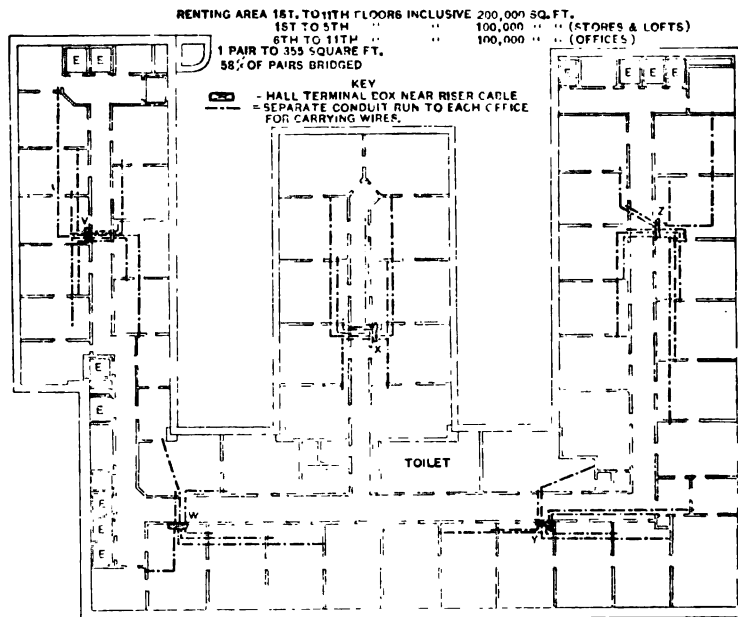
11-STORY OFFICE BUILDING, TYPICAL FLOOR PLAN.
